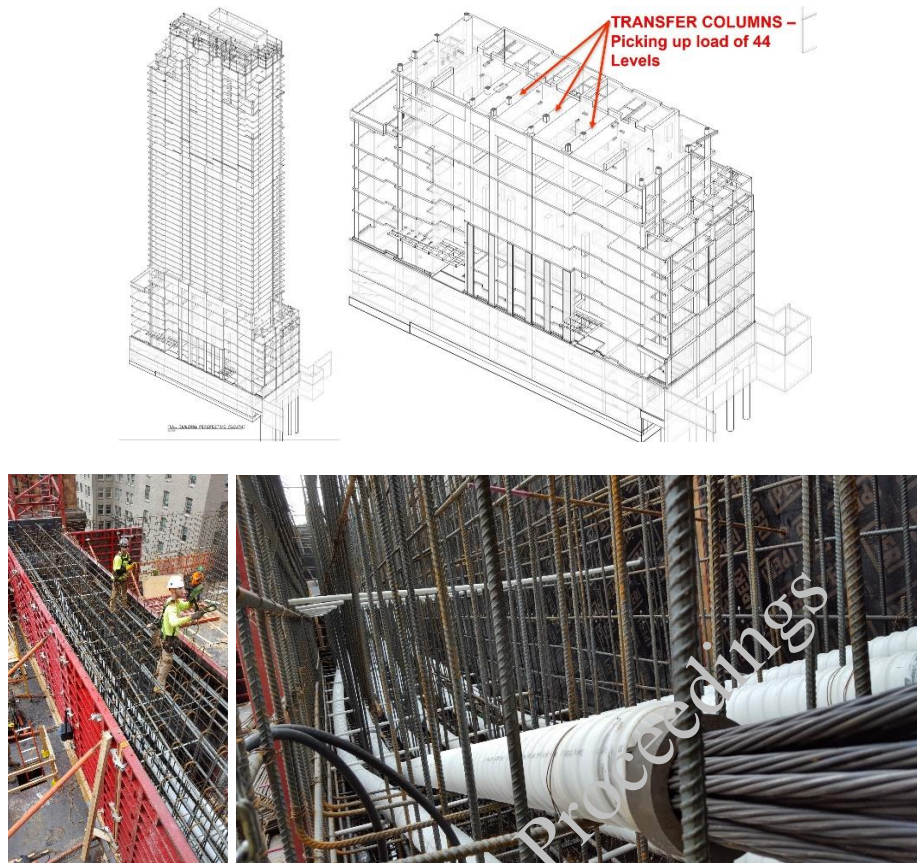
52-story Westin Hotel in Philadelphia with Transfer Girders on Level 8 supporting 44 Levels
